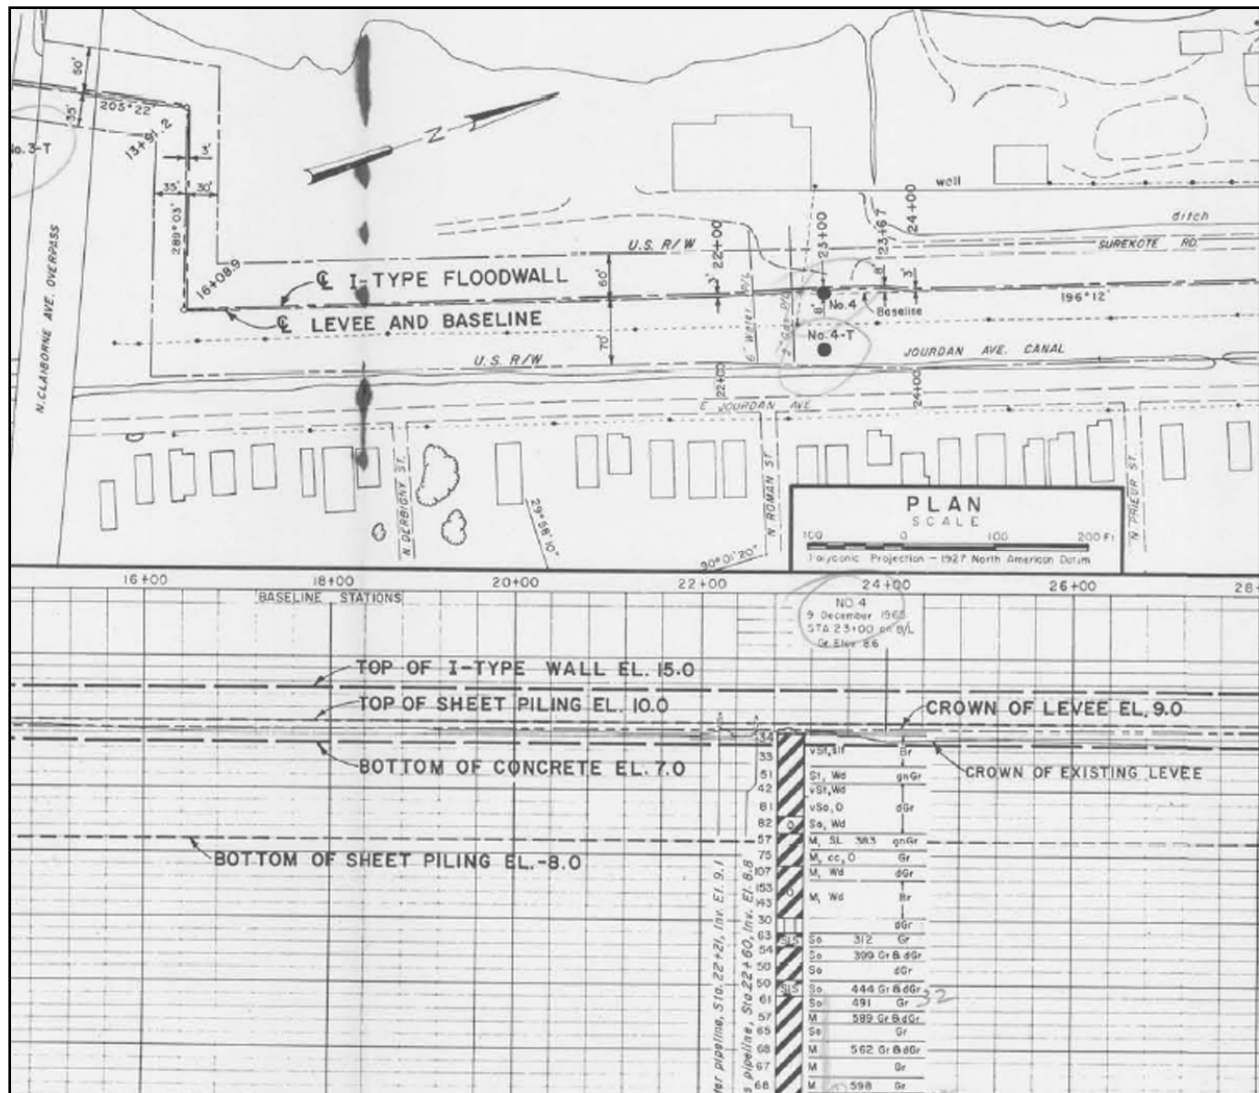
Nearby Soil Boring No. 4 Shows Existing Levee Soil and Elevations (from DM3 Chalmette drawing file H-2-23820, plate 3)
